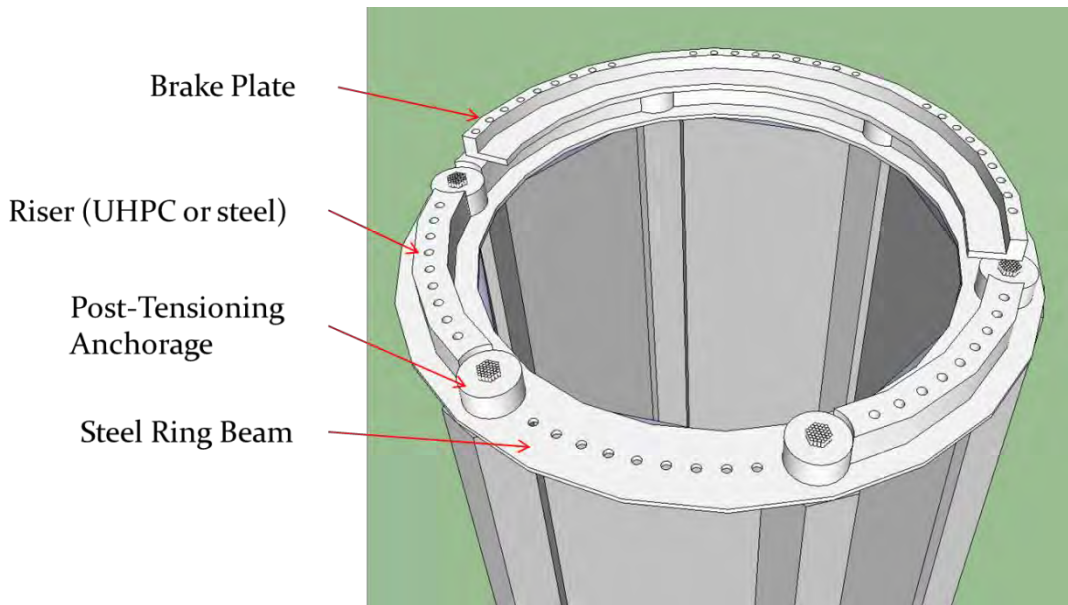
Proposed Yaw Bearing Connection at Tower Top
